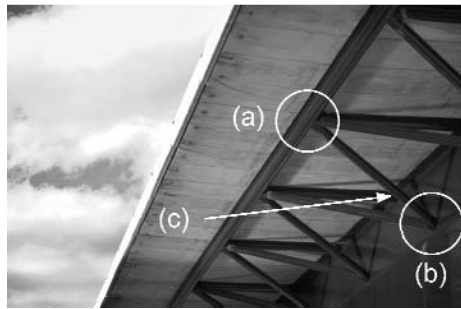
Connections between (a) longitudinal chord, diagonals and tie; (b) diagonals and box girder; (c) tie and box girder.
